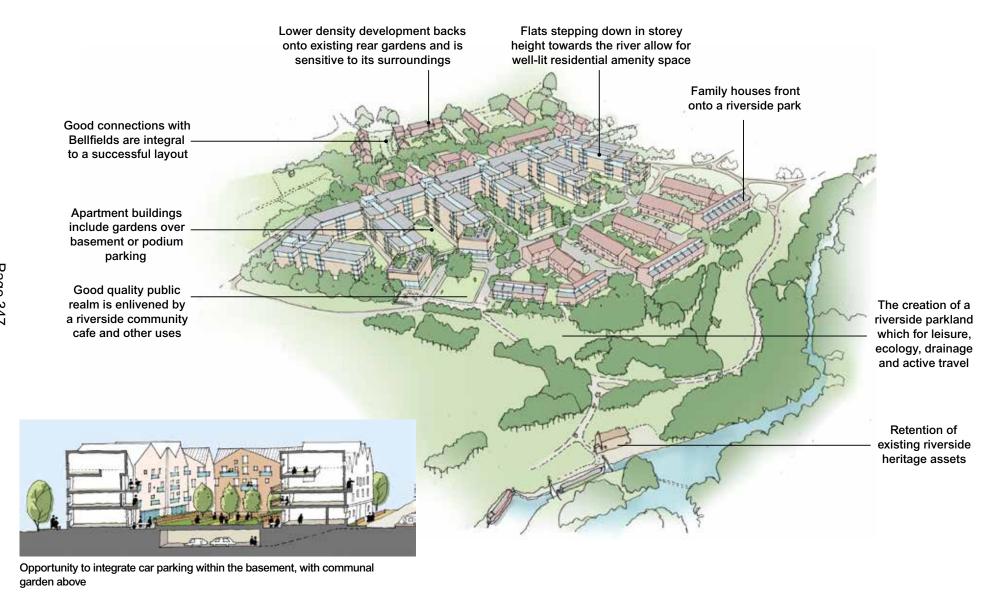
Illustrative visualisation of a residential section of Slyfield looking north
